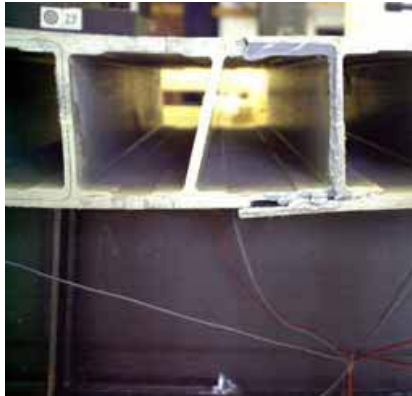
Initial failure of DuraSpan hybrid girder in the joint in the mid-span(Gurtler, 2004)
